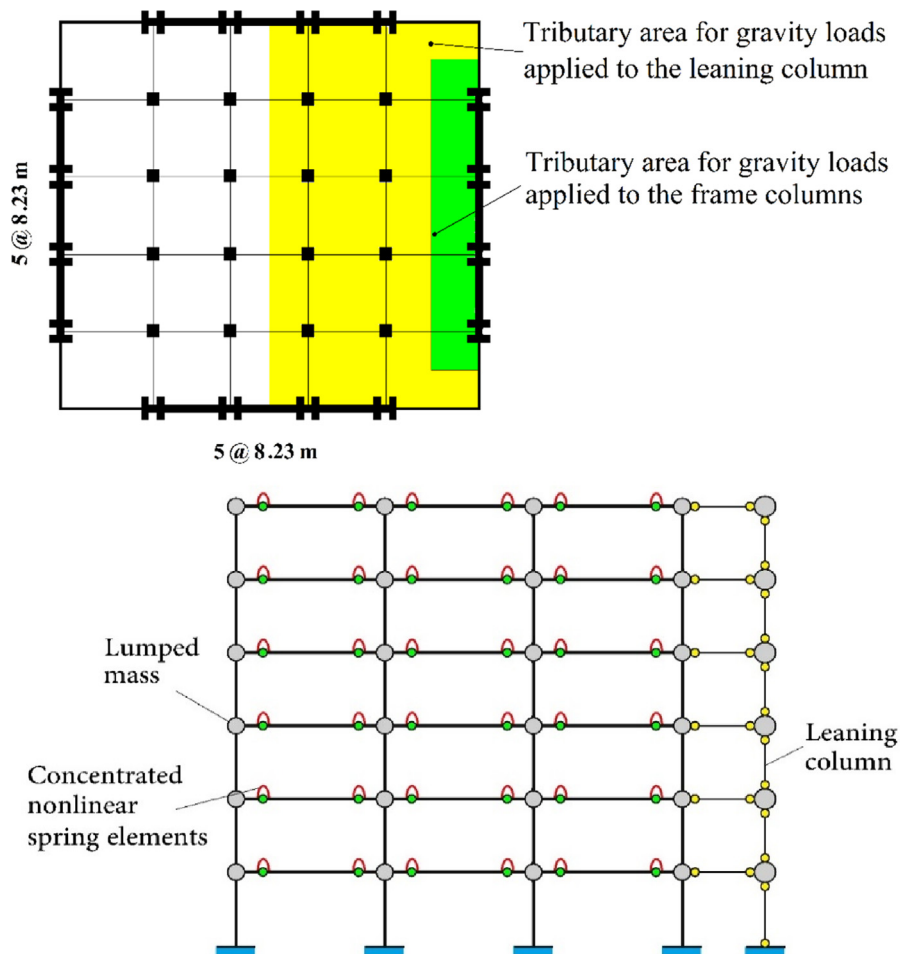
Structural modeling of the 6-story SMRF, (a) floor plan of building, (b) lumped plasticity model of SMRF.
